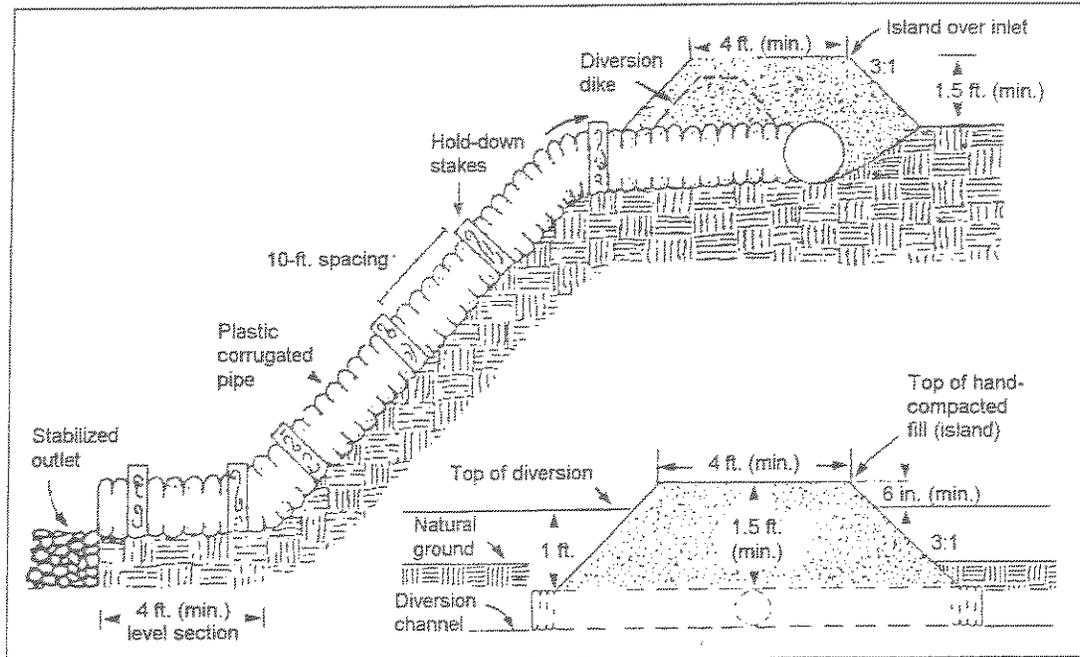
D. Cross-section view of a temporary slope drain, with detail of inlet.
